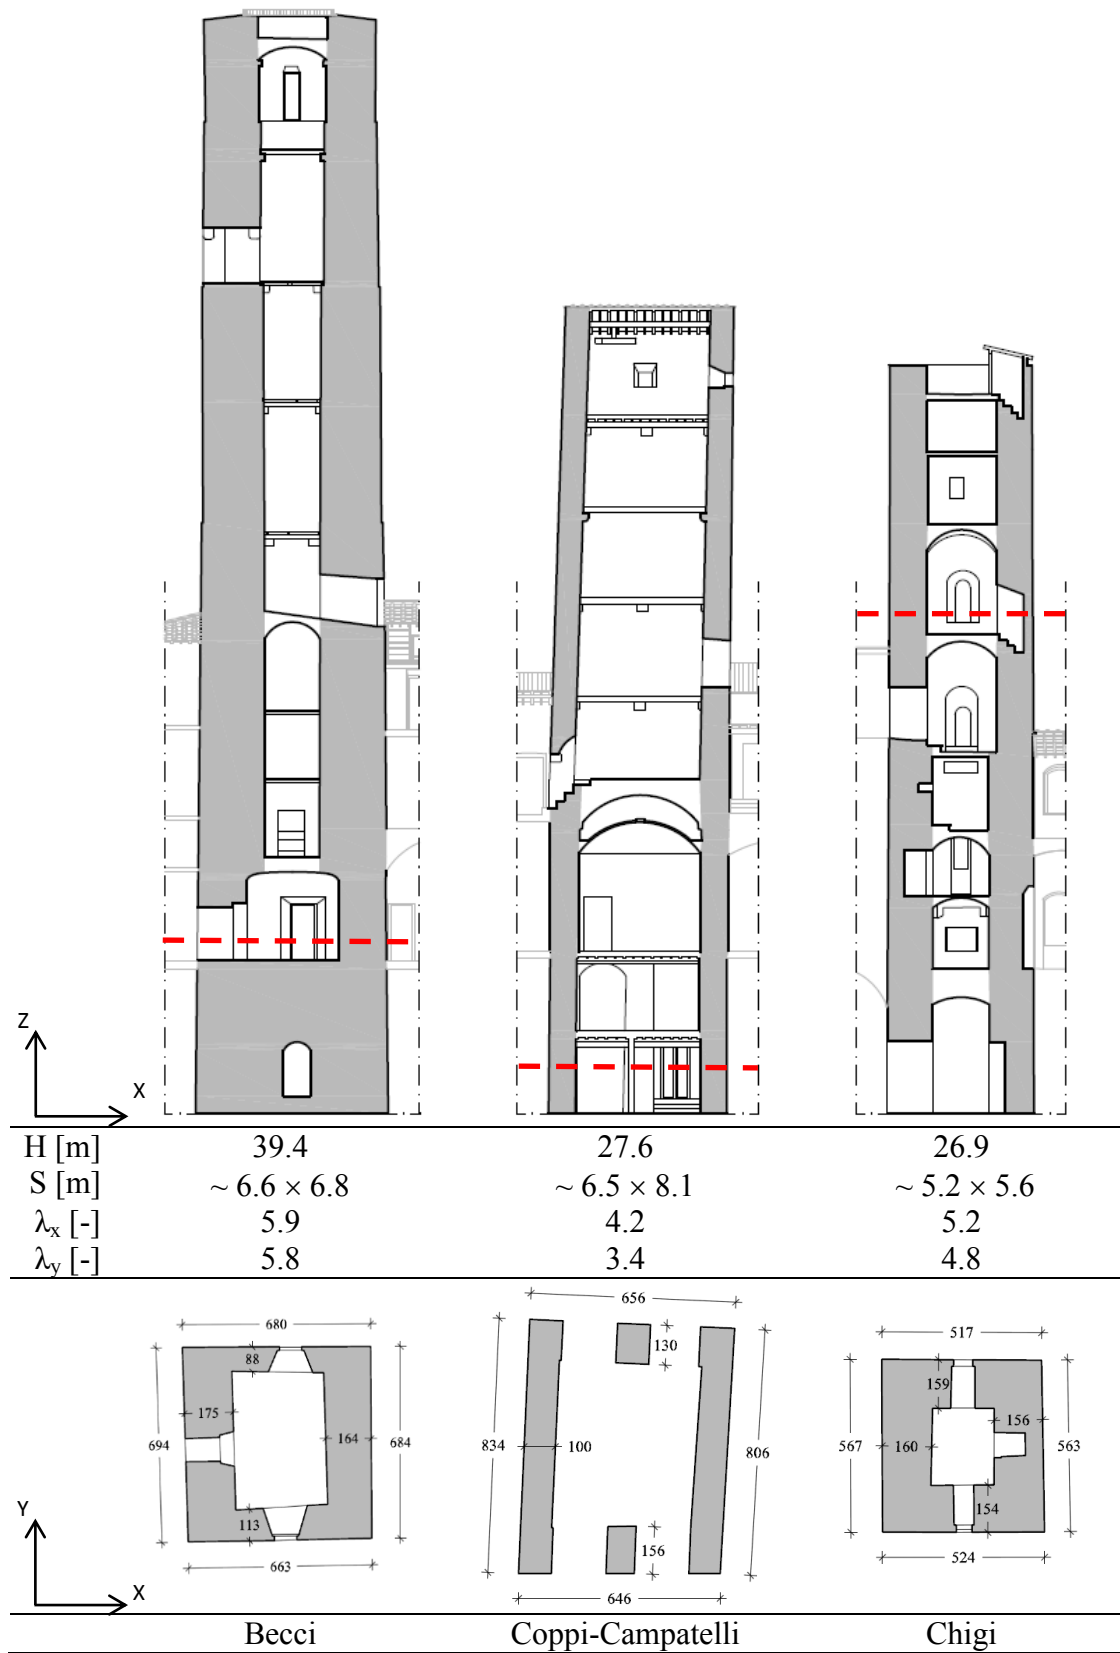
Towers sections and cross sections (H – height, S – base section dimension,  $\lambda_{x,y}$  – slenderness).
